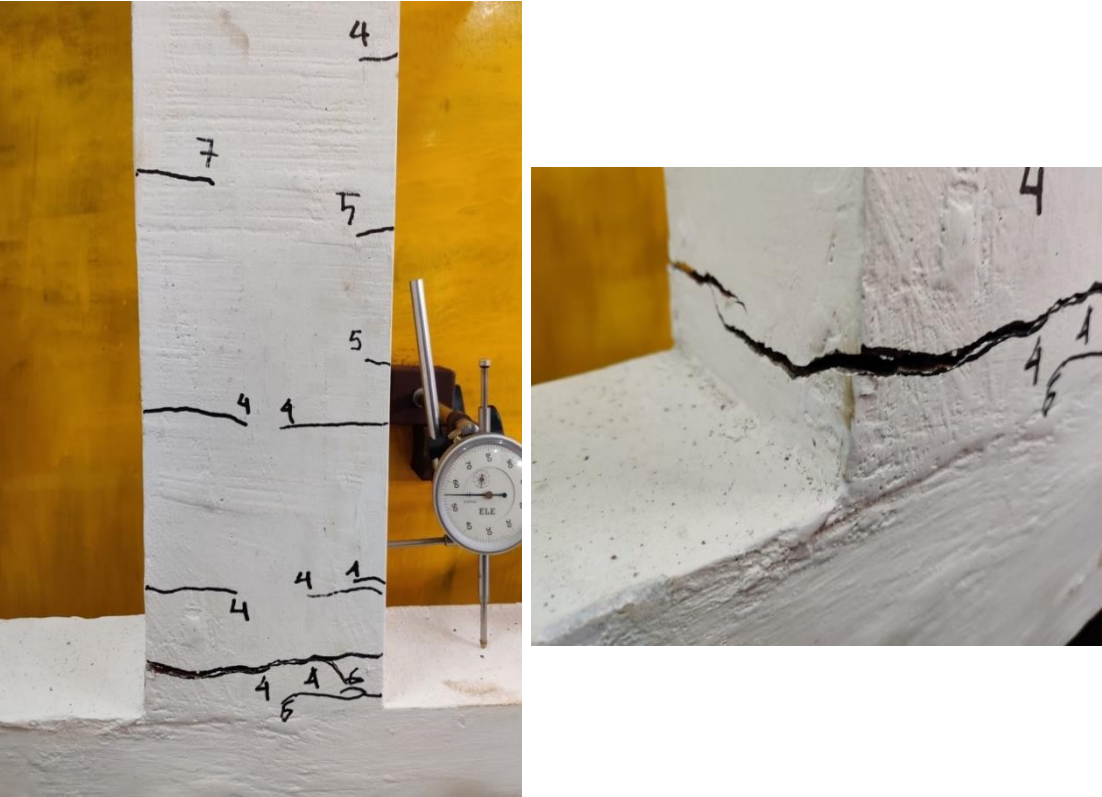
(a) Cracks in specimen 2-BB-C2 (b) Failure zone of specimen 2-BB-C2
